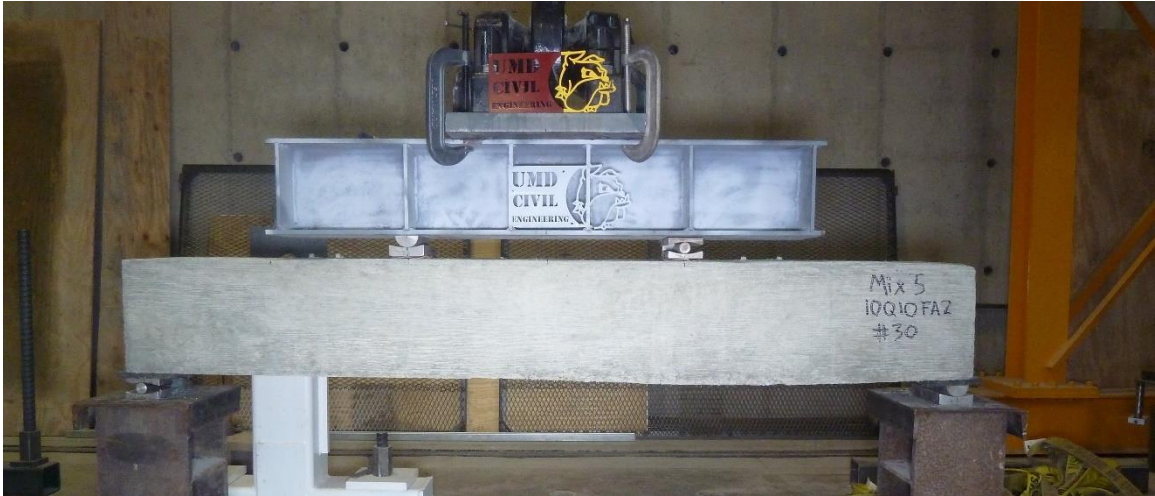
Mixture 5 (10Q10FA2) beam #30: concrete beam before testing.
